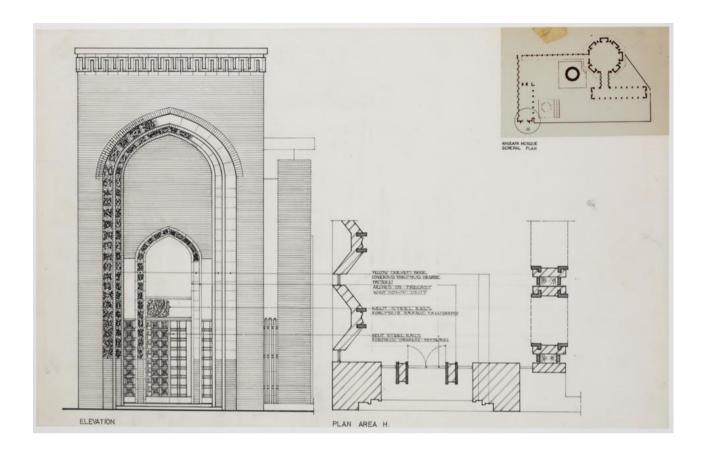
Elevation of the entrance portal with plan of its structural details. On the top right corner, a plan of the mosque. Source: (Aga Khan Documentation Center at MIT; Mohamed Makiya Archive).
